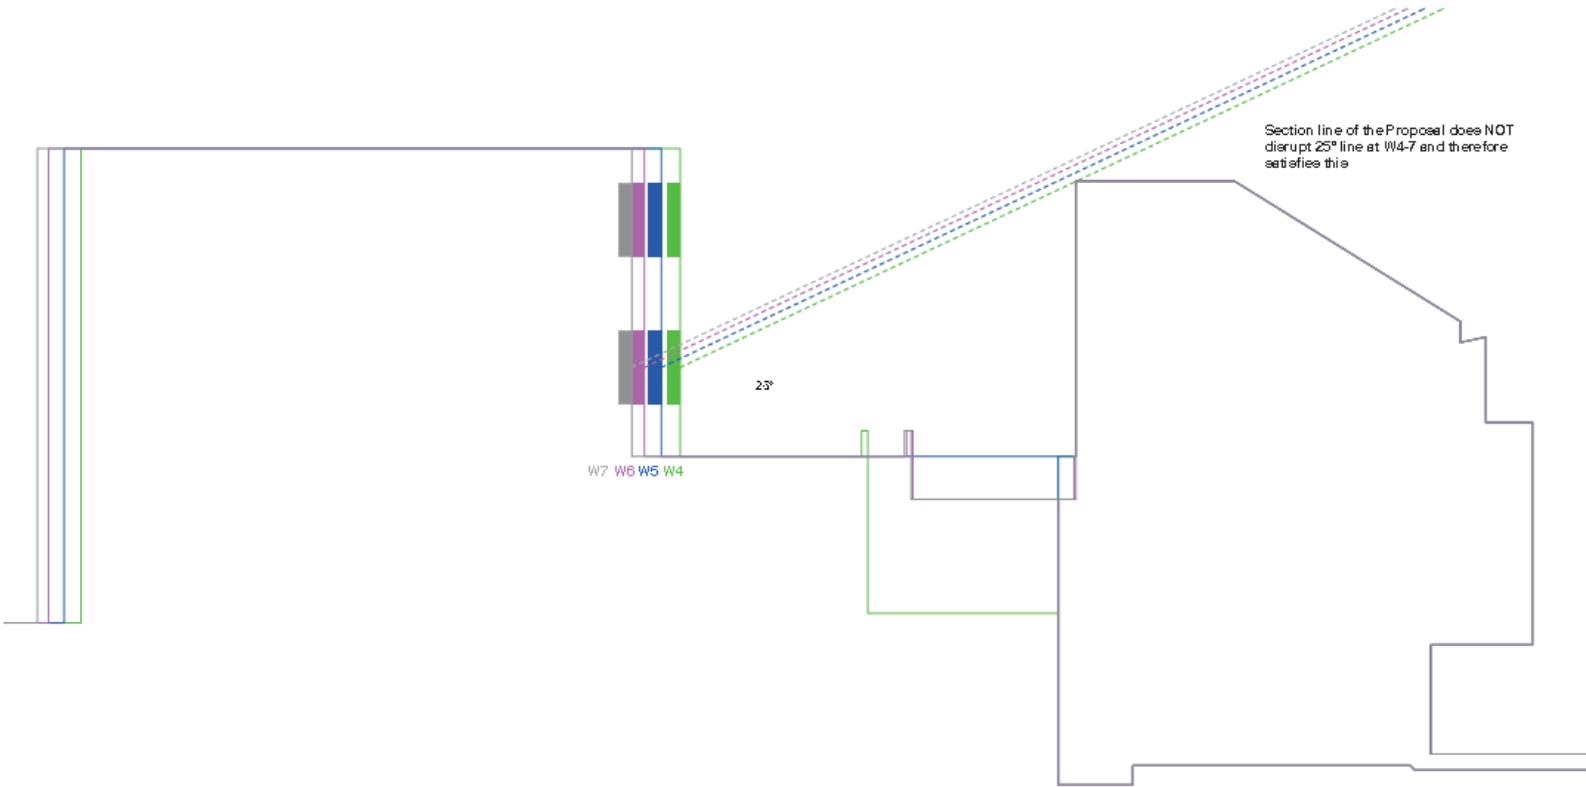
Section of Proposed development with No 42 Fieldgate Street set behind it
